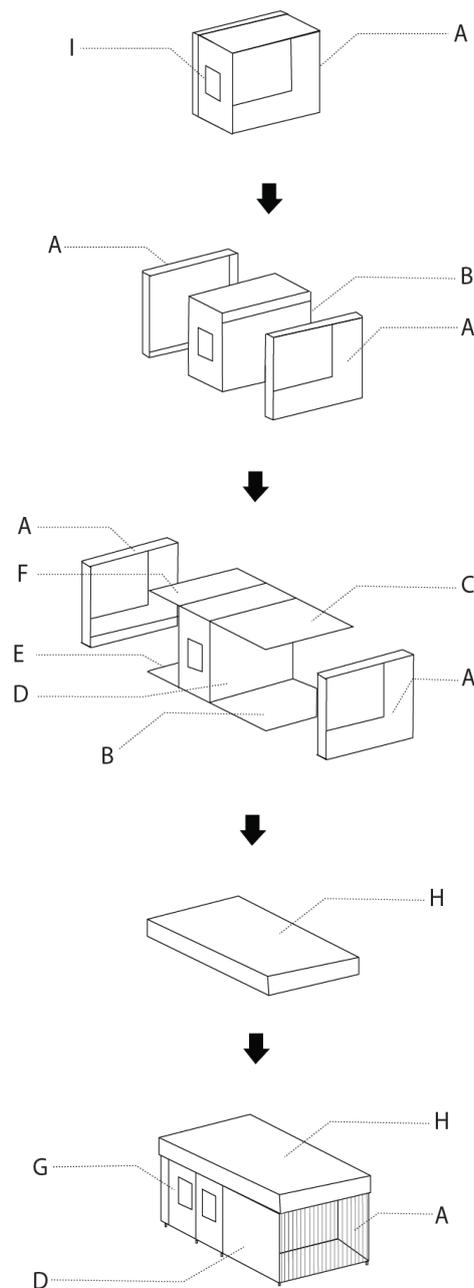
Isometric view of sustainable housing combined unit structure. A: Baseplate; B: Left apical plate; C: Roof tarpaulin; D: Left backside wallboard; E: Floor baseplate; F: Roof apical plate; I: window; G: Backside wallboard; H: Roofboard I; Roof apical plate.
